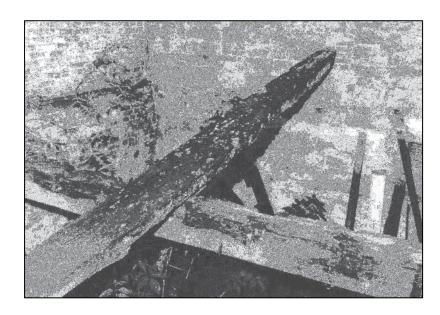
Building C, fallen timbers, N 1F room, looking SW (photo 4/10).
